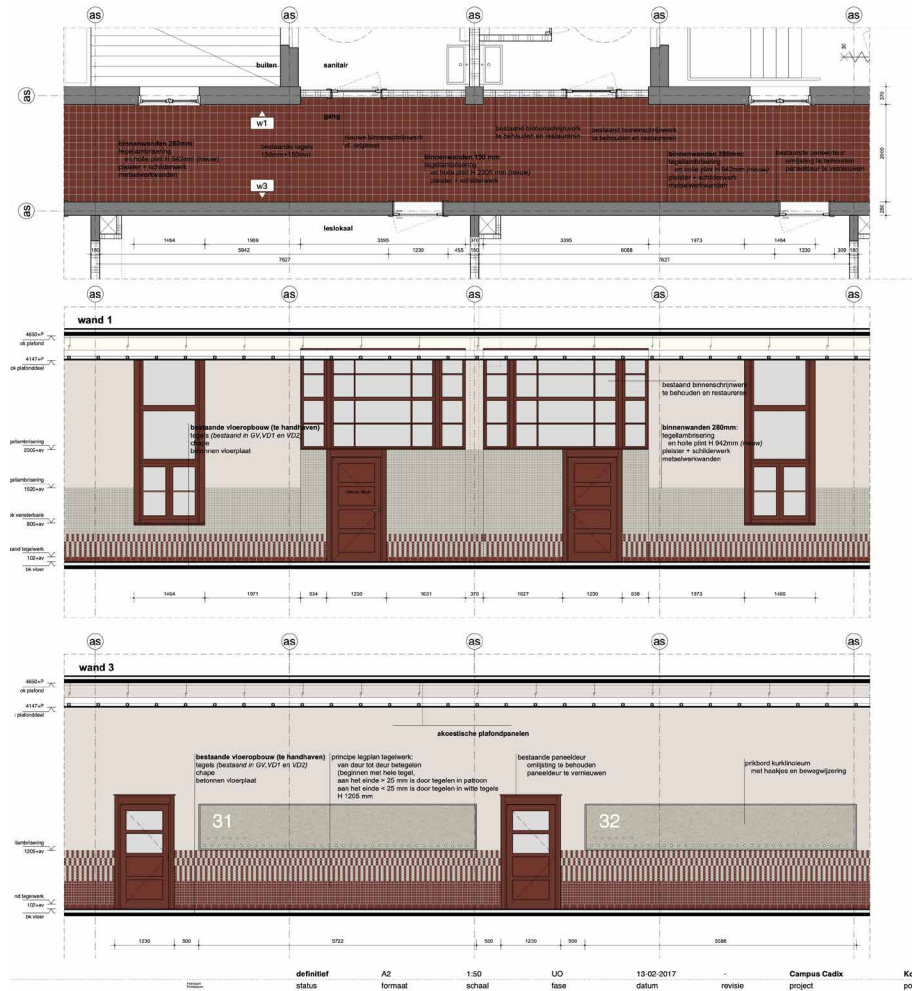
interior elevations of the old building from the Campus Cadix. Source: KSA
